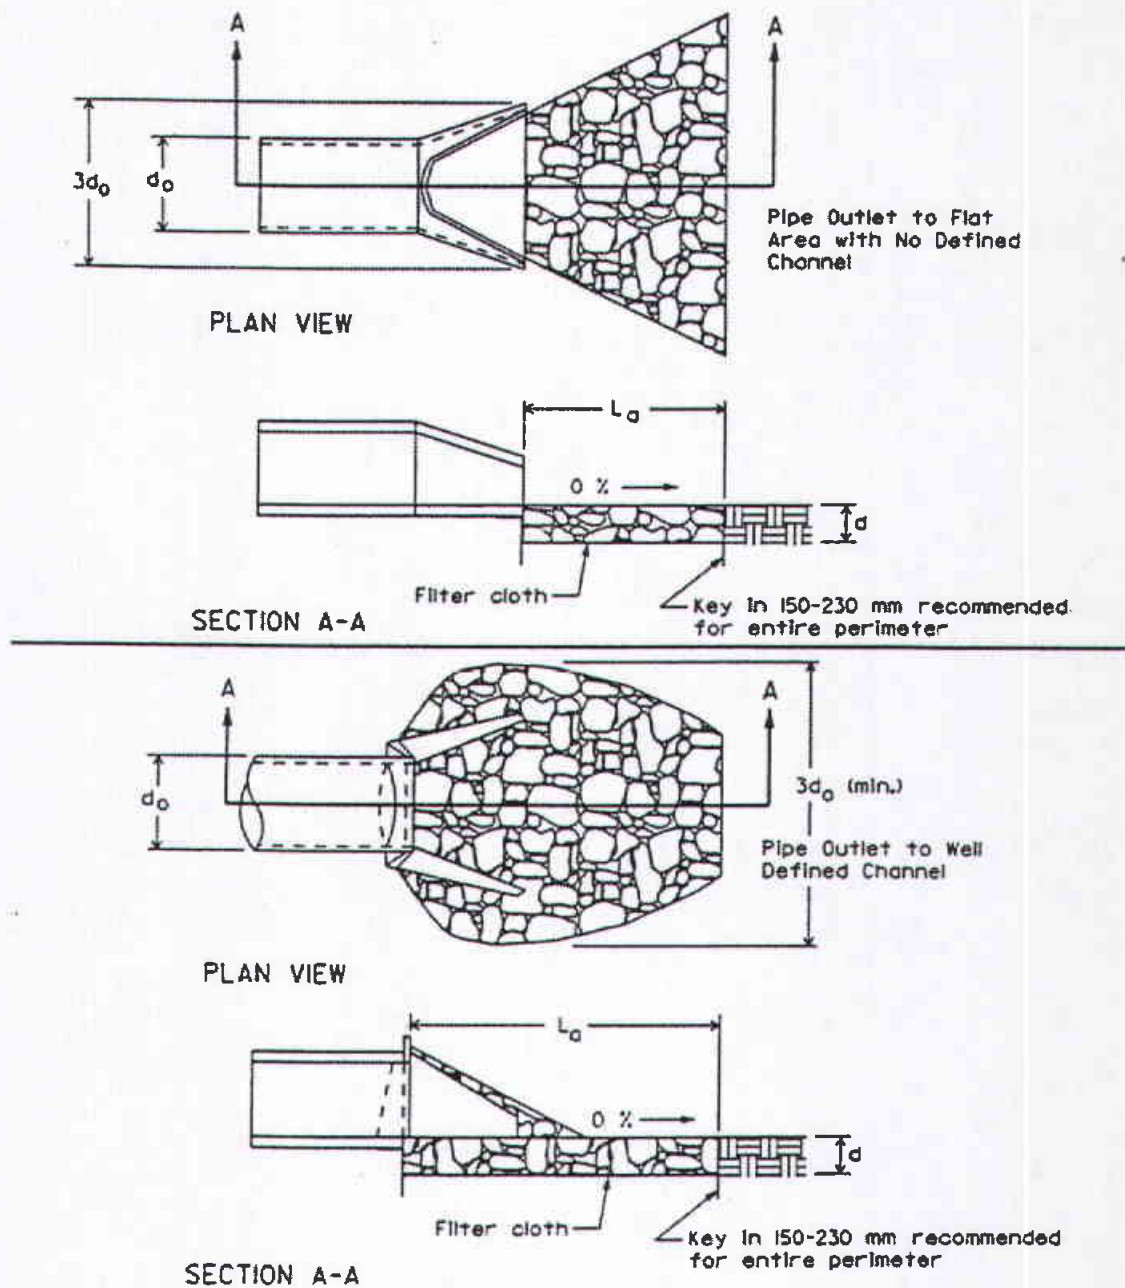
Culvert outlet protection (from U.S. Department of Transportation, 1995).
